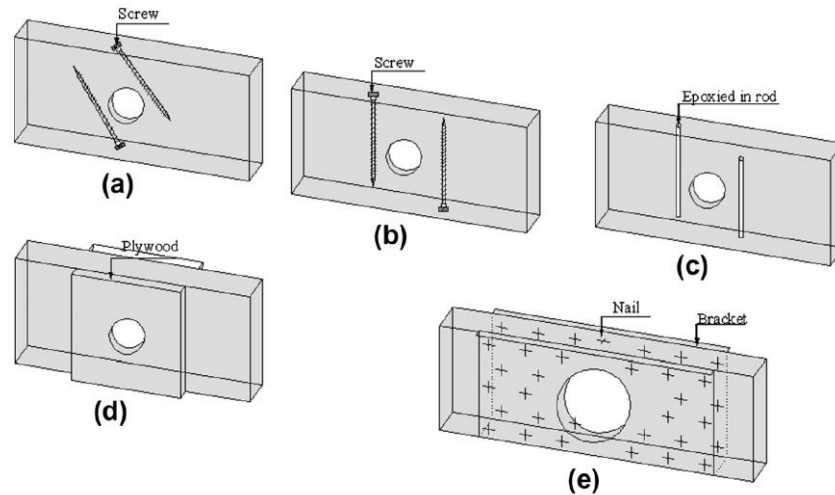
Concepts for reinforcing LVL beams. (Ardalany et al., 2013)
